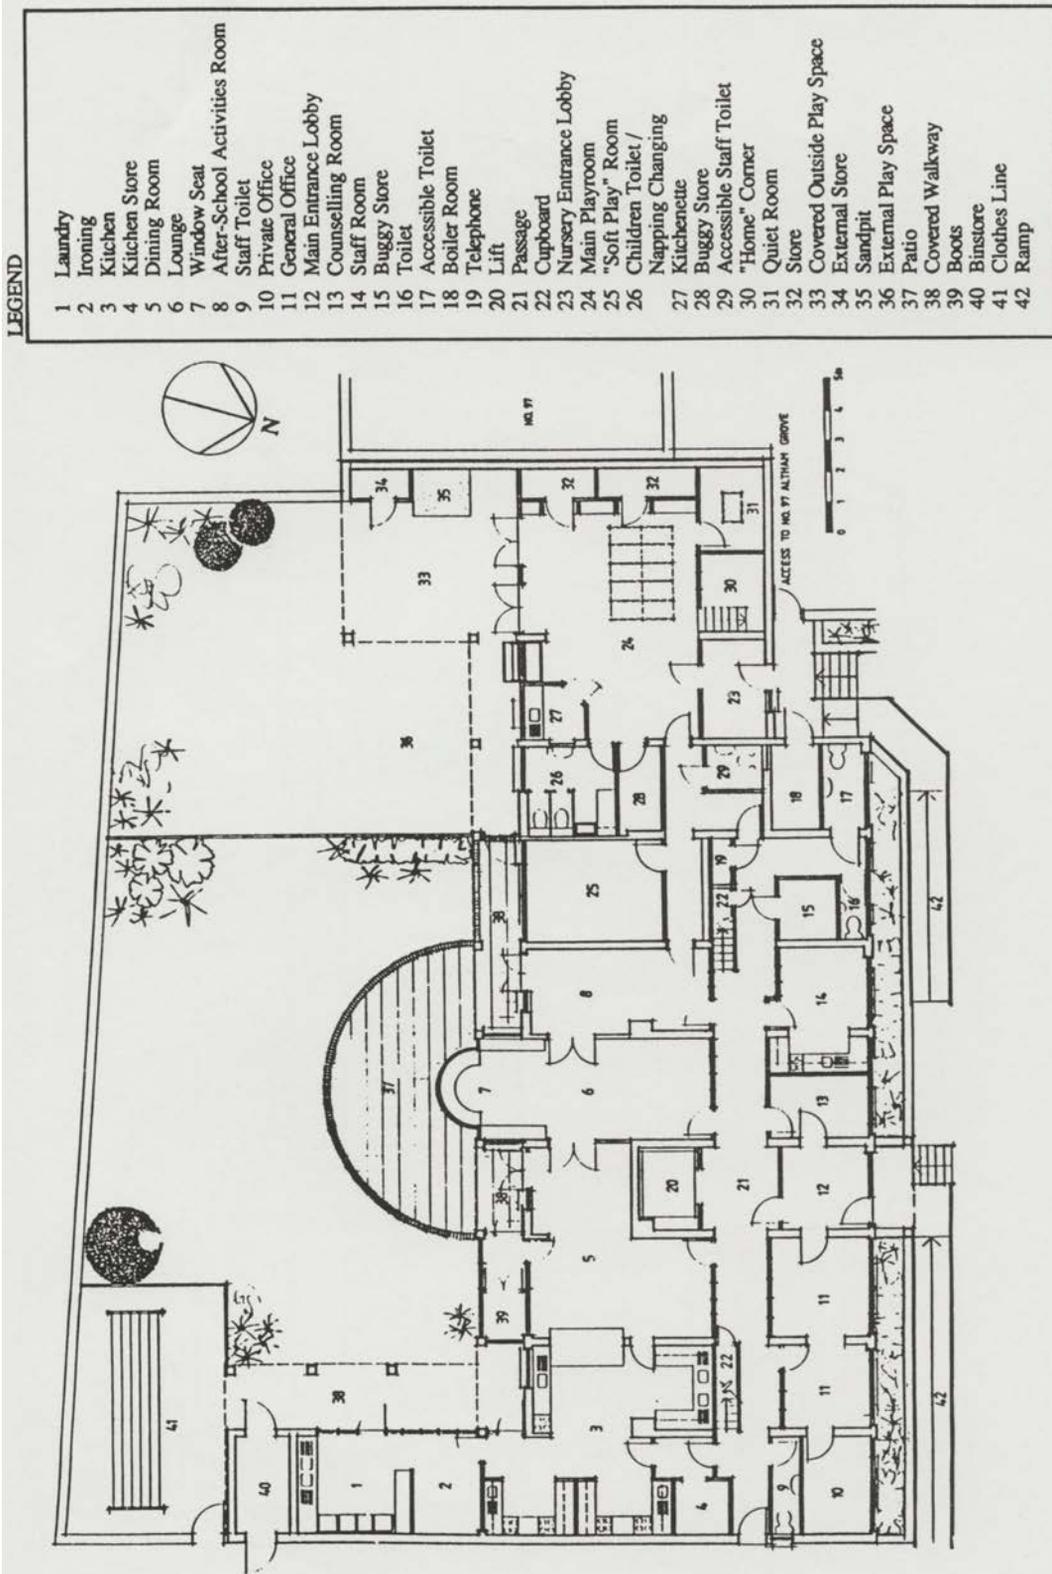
Proposed ground floor plan, Harlow Women's Aid.
